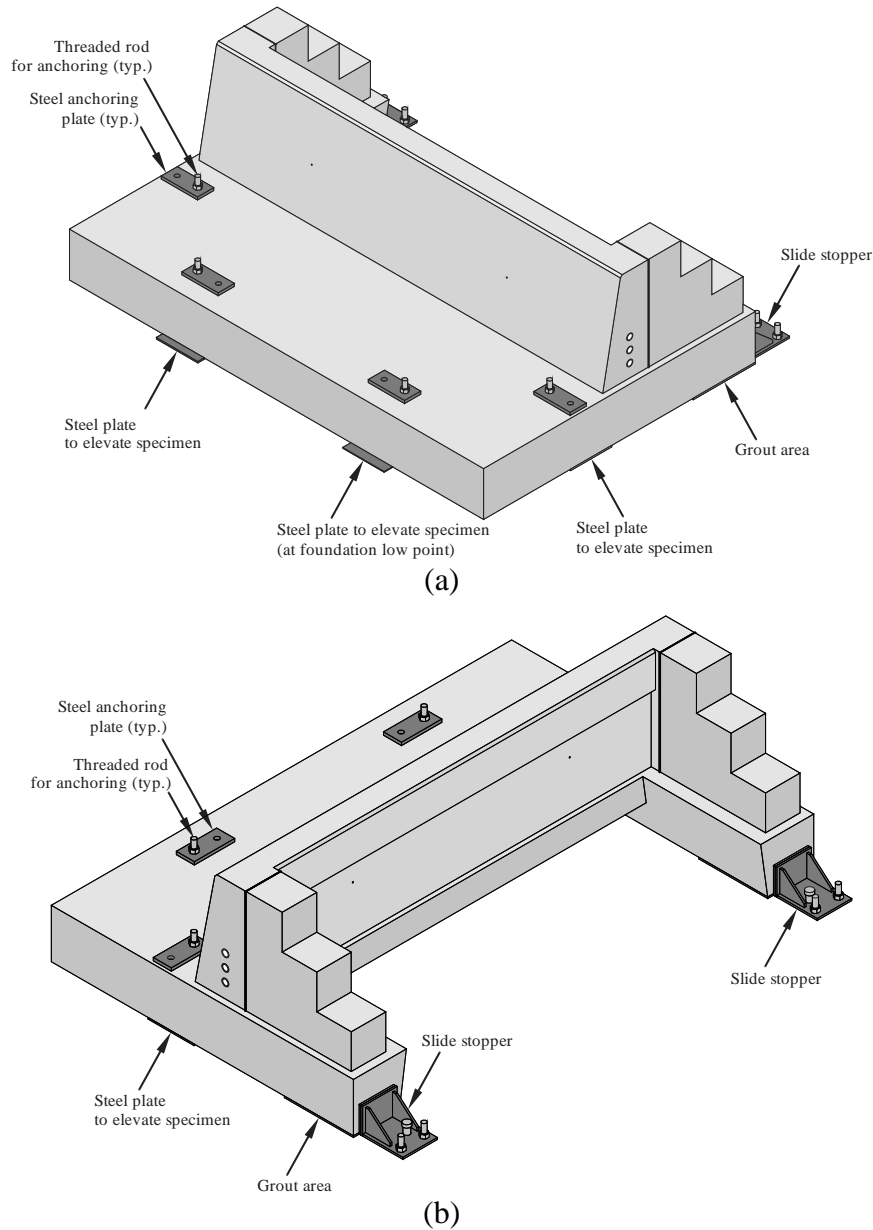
Diagram of impact test specimen with additional anchoring elements placed:
